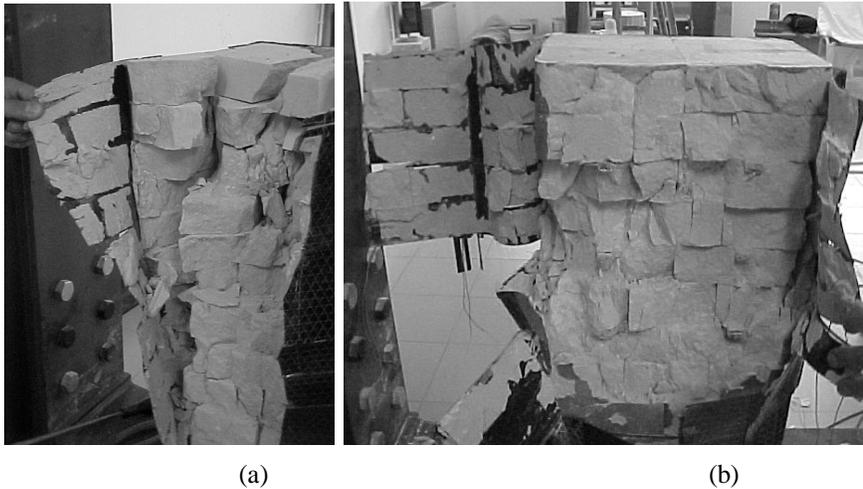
Columns after failure and cutting of the FRP jacket: specimen R2 confined with FRP laminates (a) and specimen R3 confined with tendons and laminates (b)
